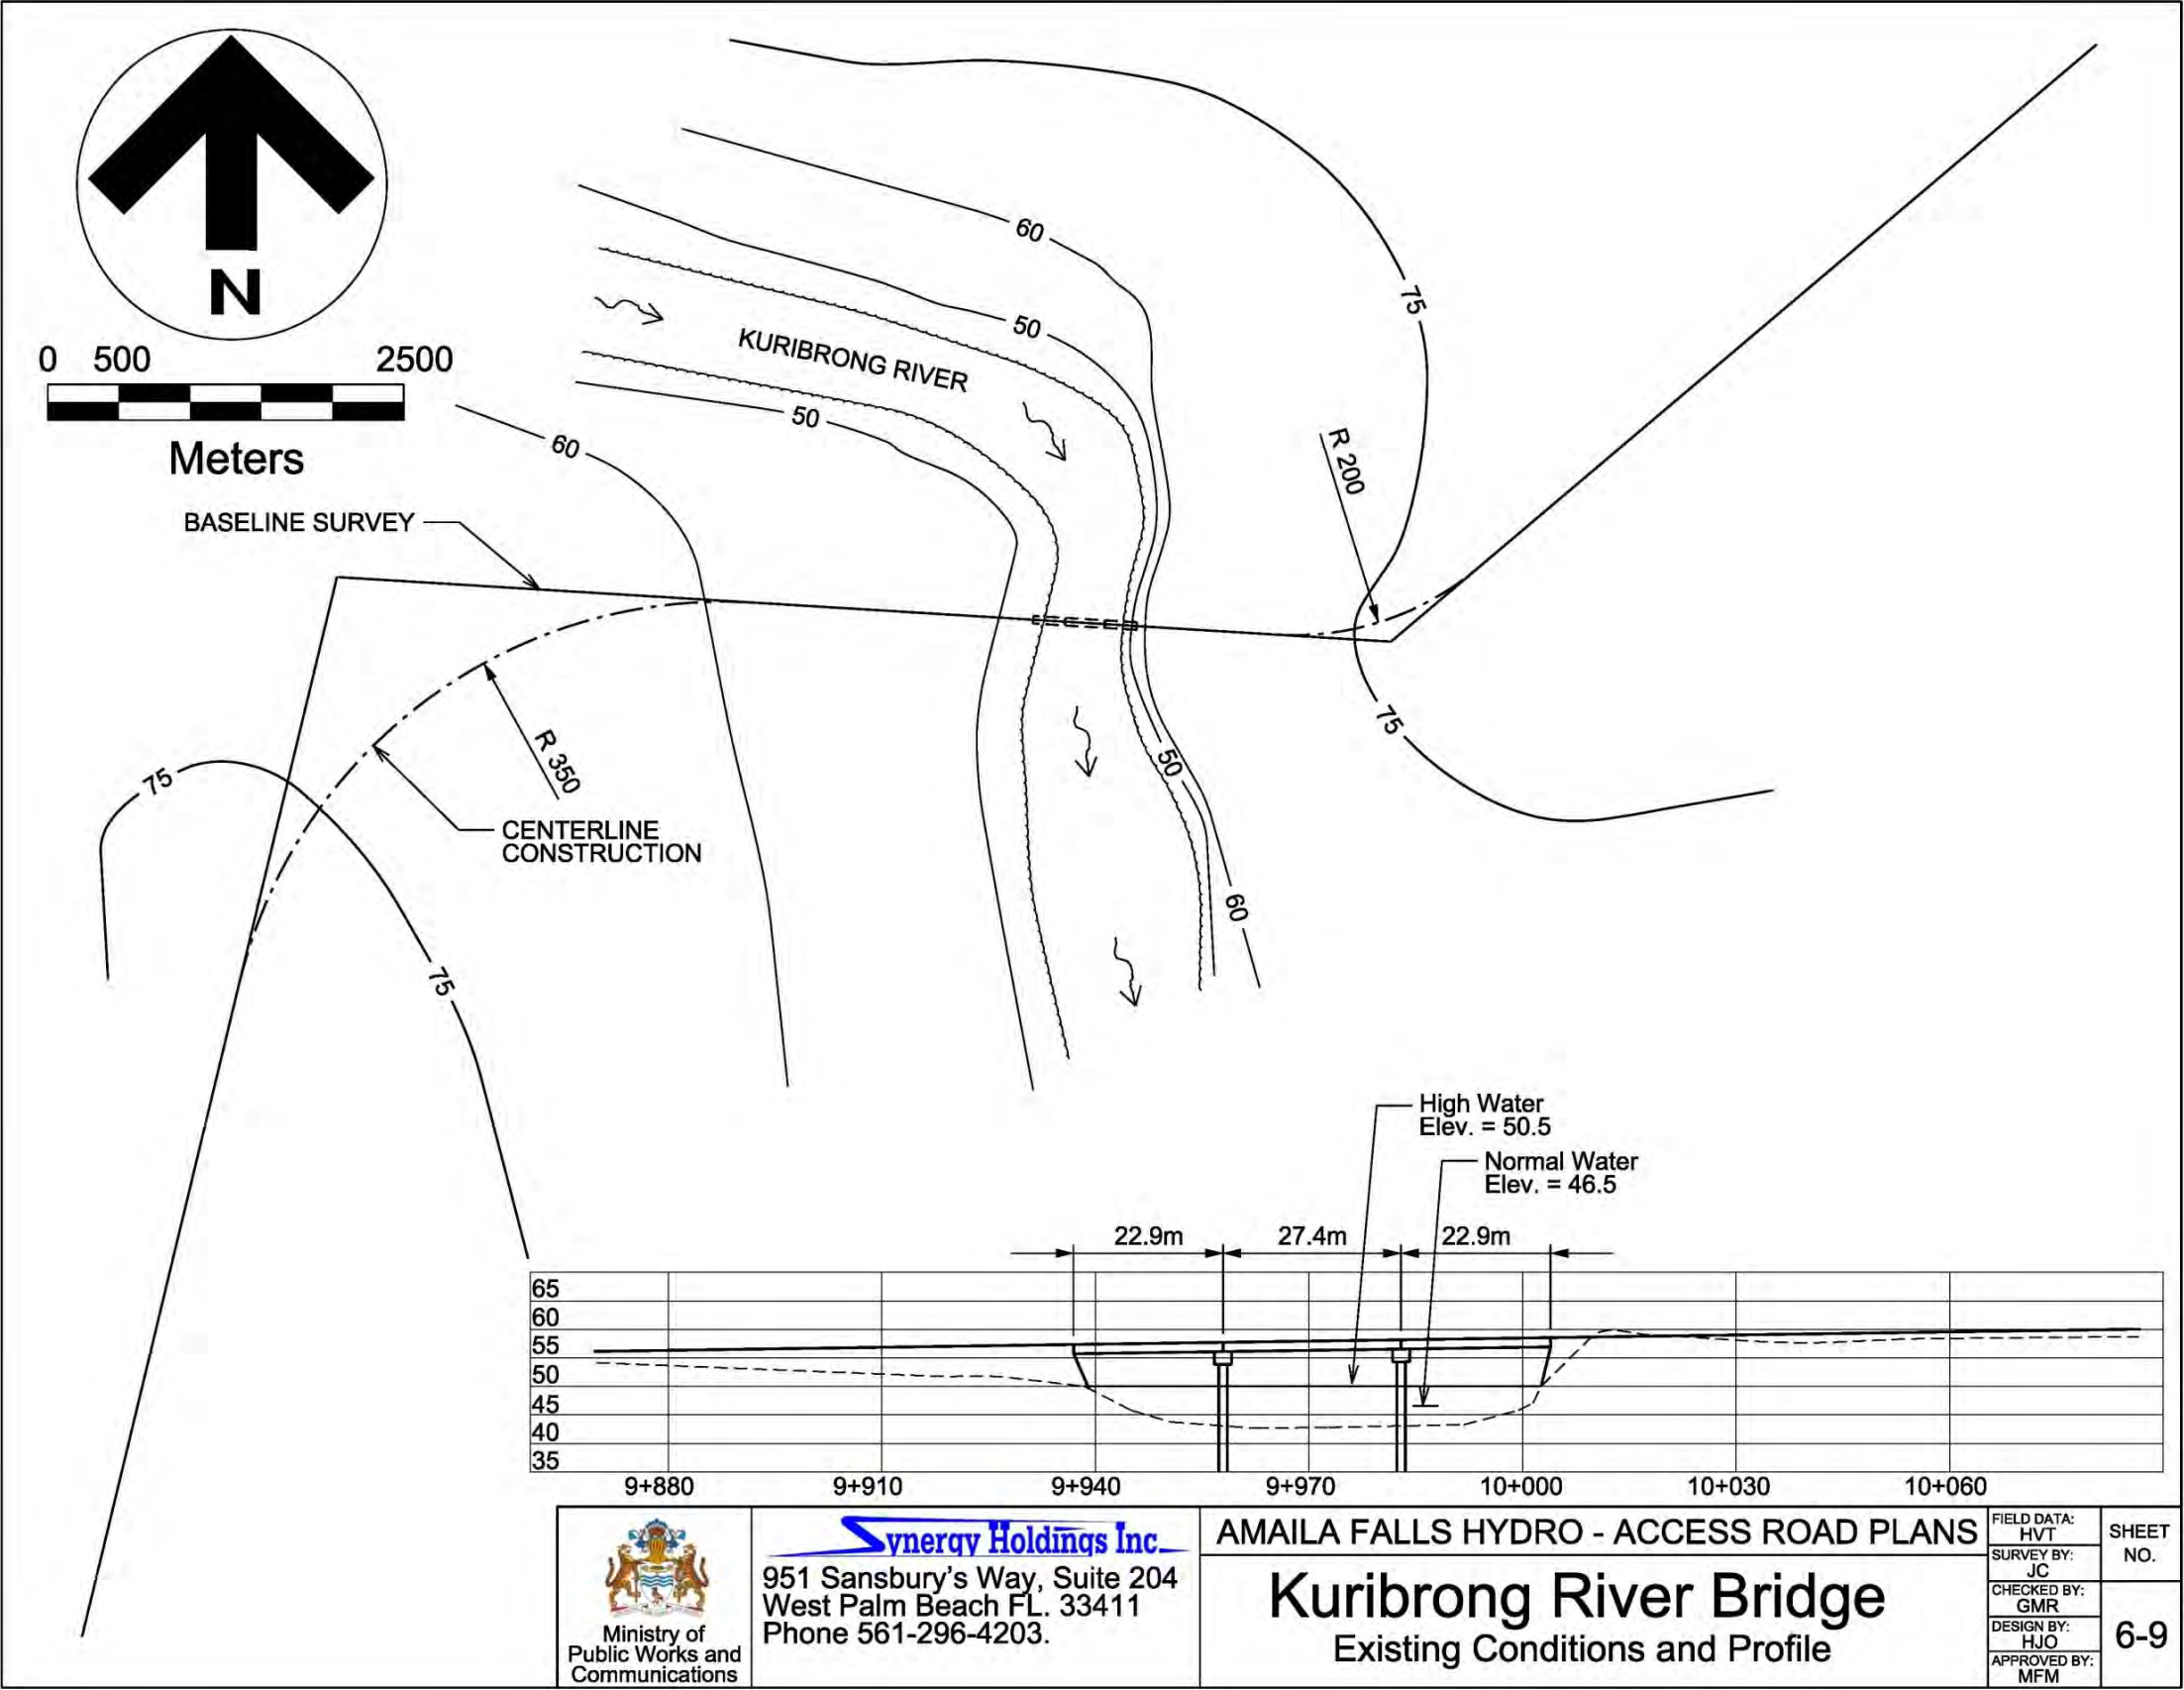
Kuribrong River Bridge, existing conditions and profile
